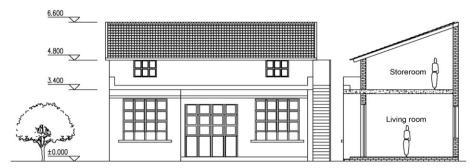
Elevation and cross section drawings of two-storey brick-concrete building
